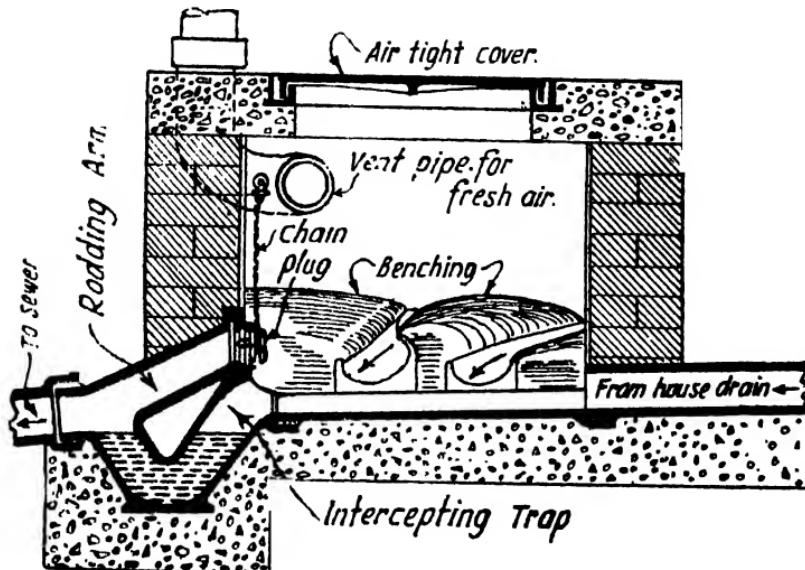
An inspection chamber of stoneware at the tail end of a house drain, with two branches connected to the drain, an intercepting trap, and a fresh air inlet.
